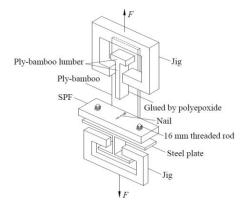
Test setup for nail connections between framing studs and glubam sheathing panels.
